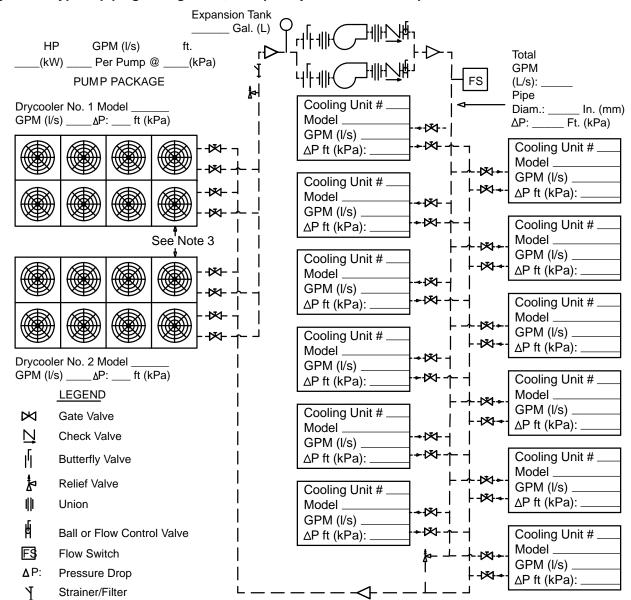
Typical piping arrangement, multiple drycoolers and multiple indoor units
